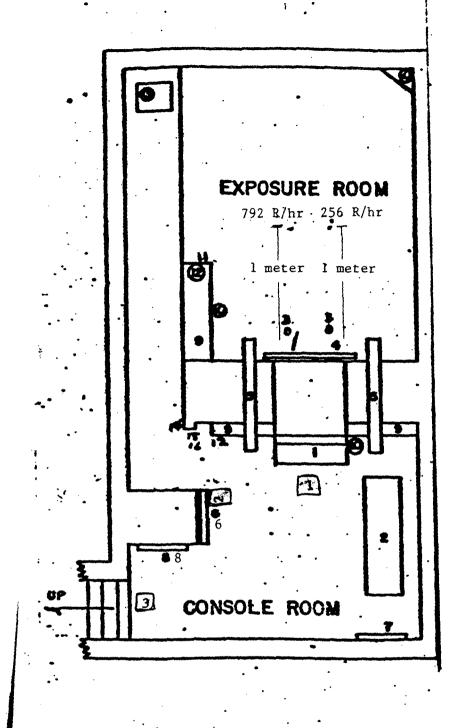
ELEVATION VIEW UNDERGROUND VAULT
